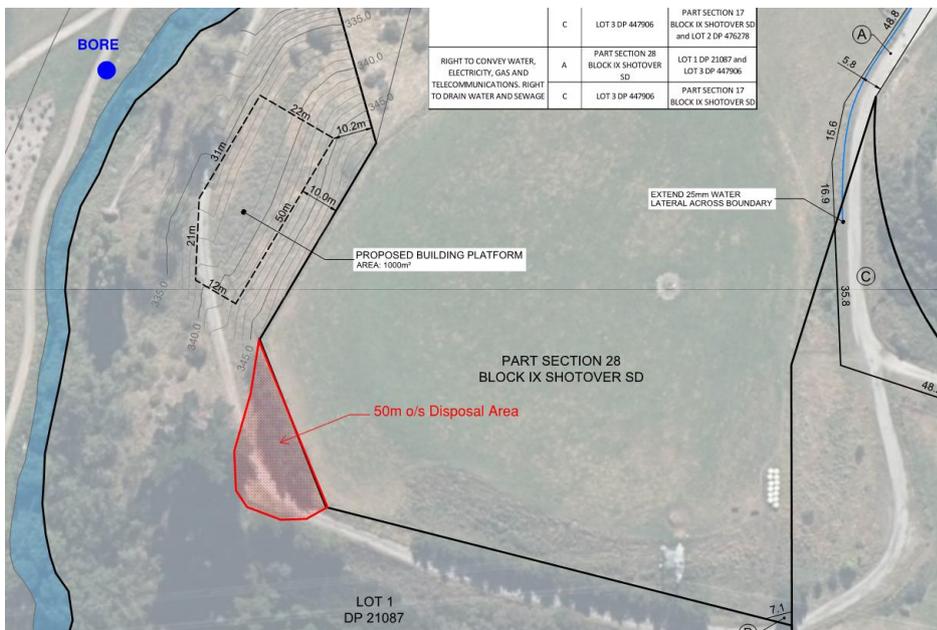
Recommended Wastewater Disposal Area (50m off-set hatched)
